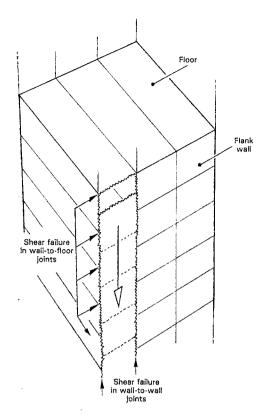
Failure mode with combination of wall-to-wall and wall-to-floor joint fáilure for low-level trigger site.
